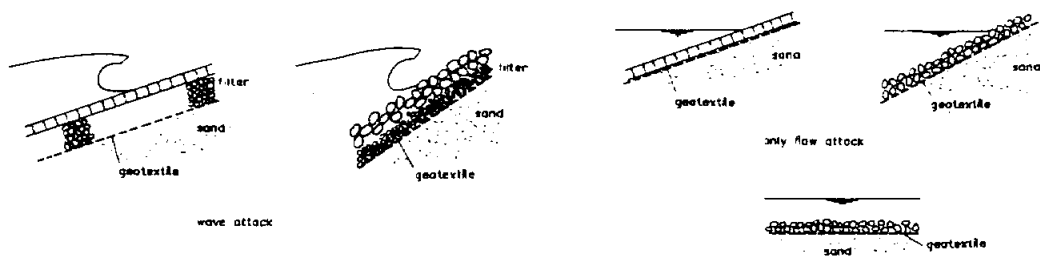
Examples of structures in which hydrodynamically sandtight geotextiles can be applied
